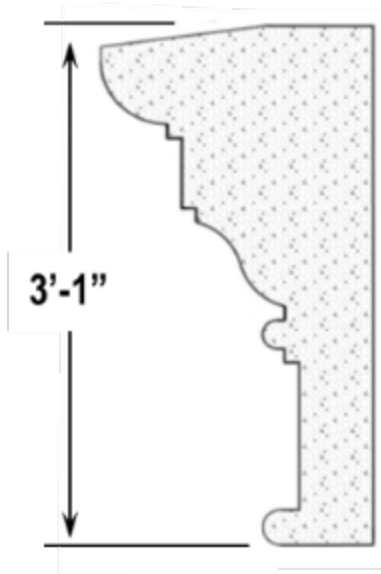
Cross-section of cornice design that PCI selected for the 3D printed mold tryouts.
